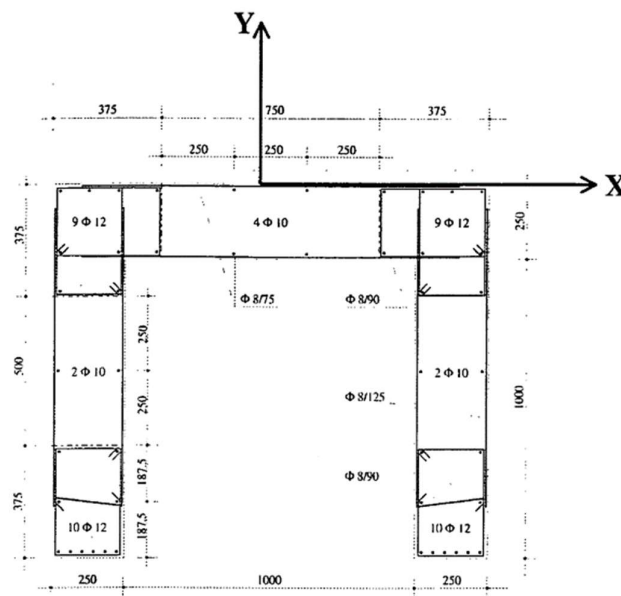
Cross Section of Ispra test specimen scale 1:1.
